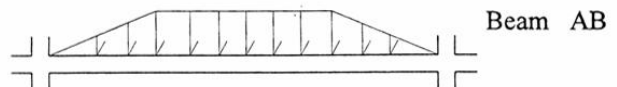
Trapezoidal distributed load for Beam AB of Fig. 2-16.
